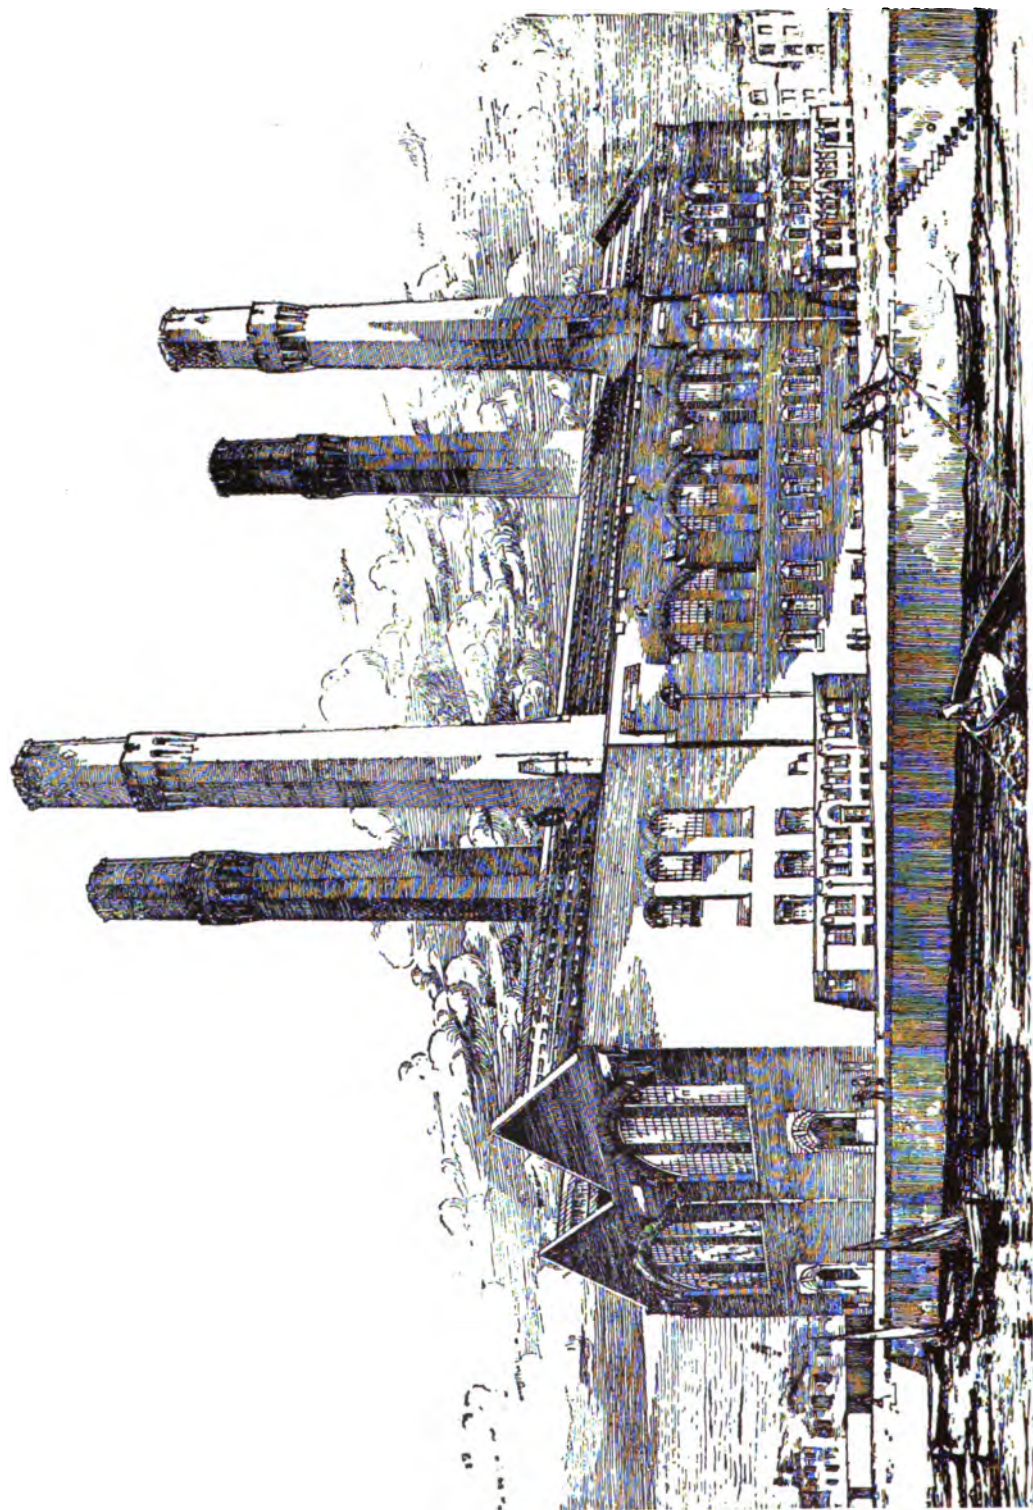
Power Plant at Greenwich (England) when complete, but not showing Pier and Coal Handling Plant.
